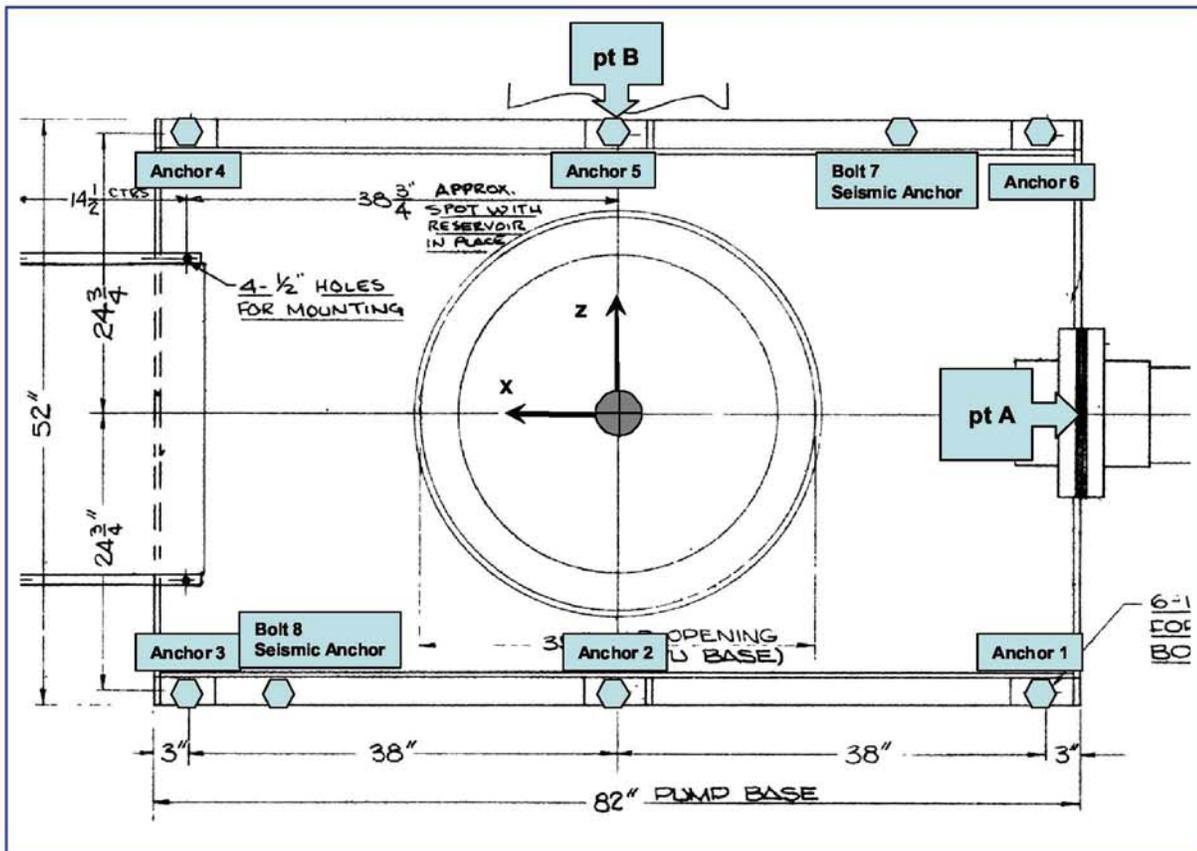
Location of concrete embedded anchors and seismic anchors
